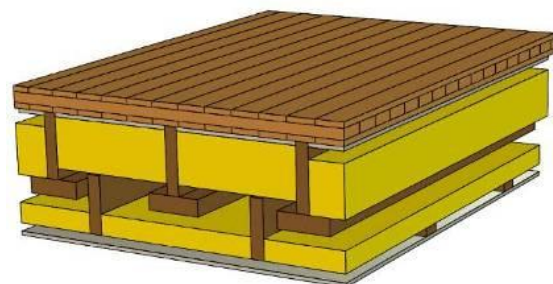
Basic drawing sketch of a finished floor structure including separate ceiling.
